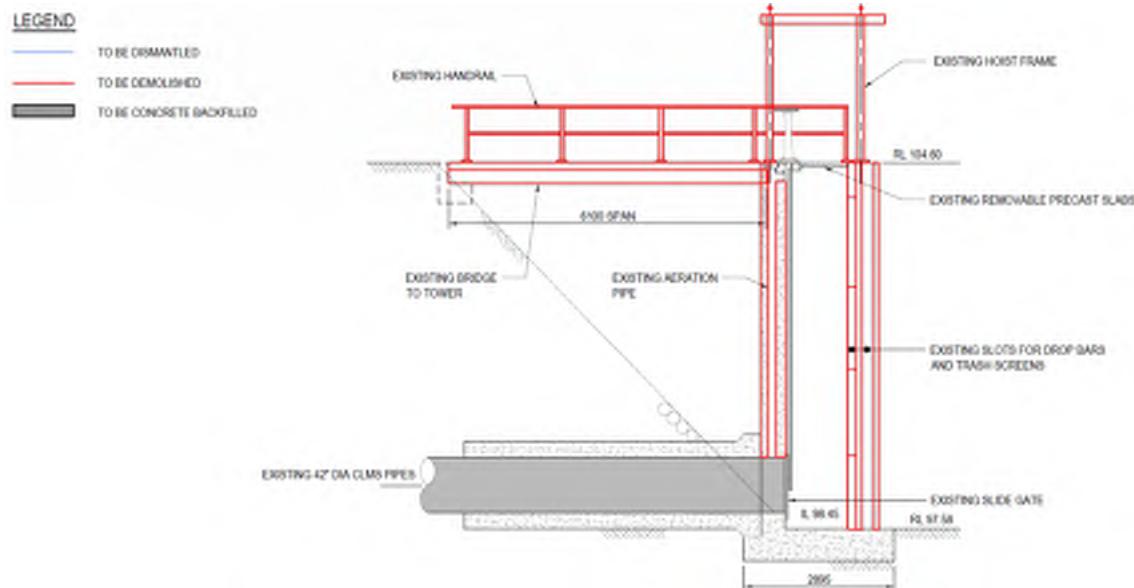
Typical section through High Level Outlet Tower – Option 1D
